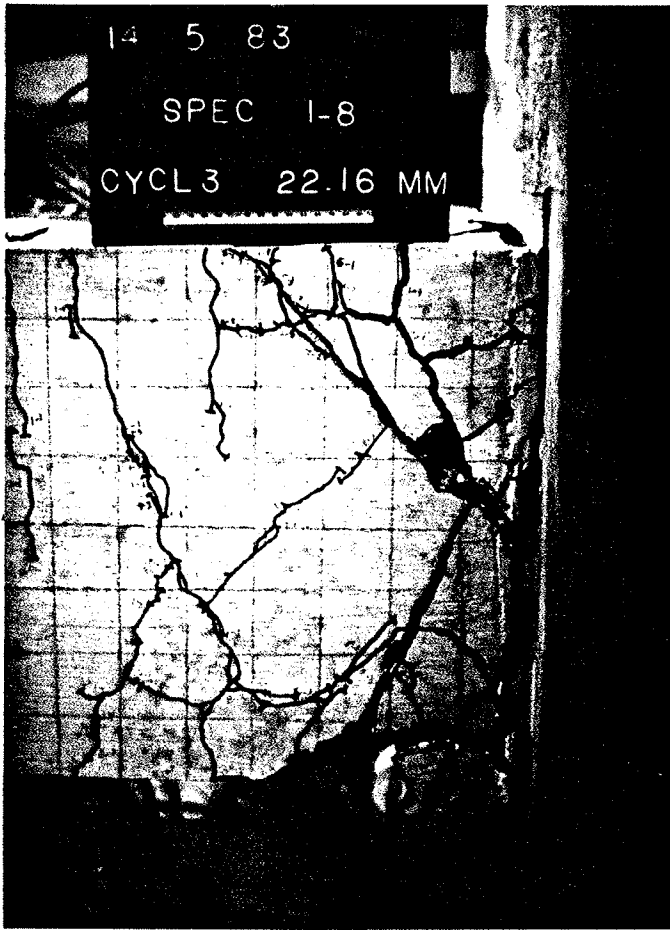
CRACK PATTERN FOR SPECIMEN 1-8 AT 8δy/3
